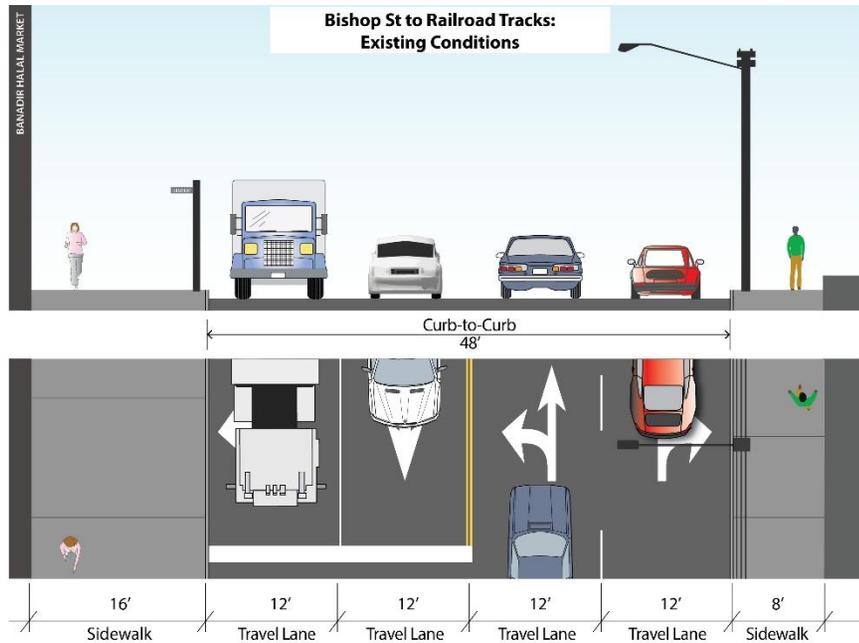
Existing Layout – Forest Avenue from Morrill's Corner (Bishop Street) to Woodfords Corner (Railroad Tracks North of Concord Street)
